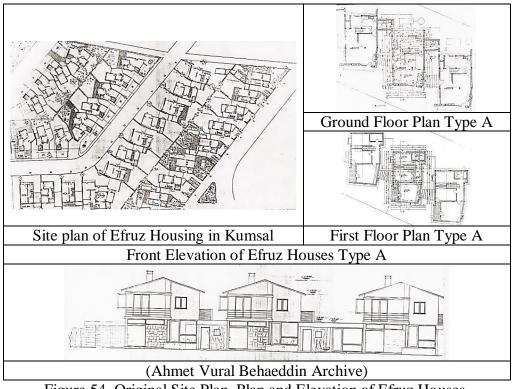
Original Site Plan, Plan and Elevation of Efruz Houses.
